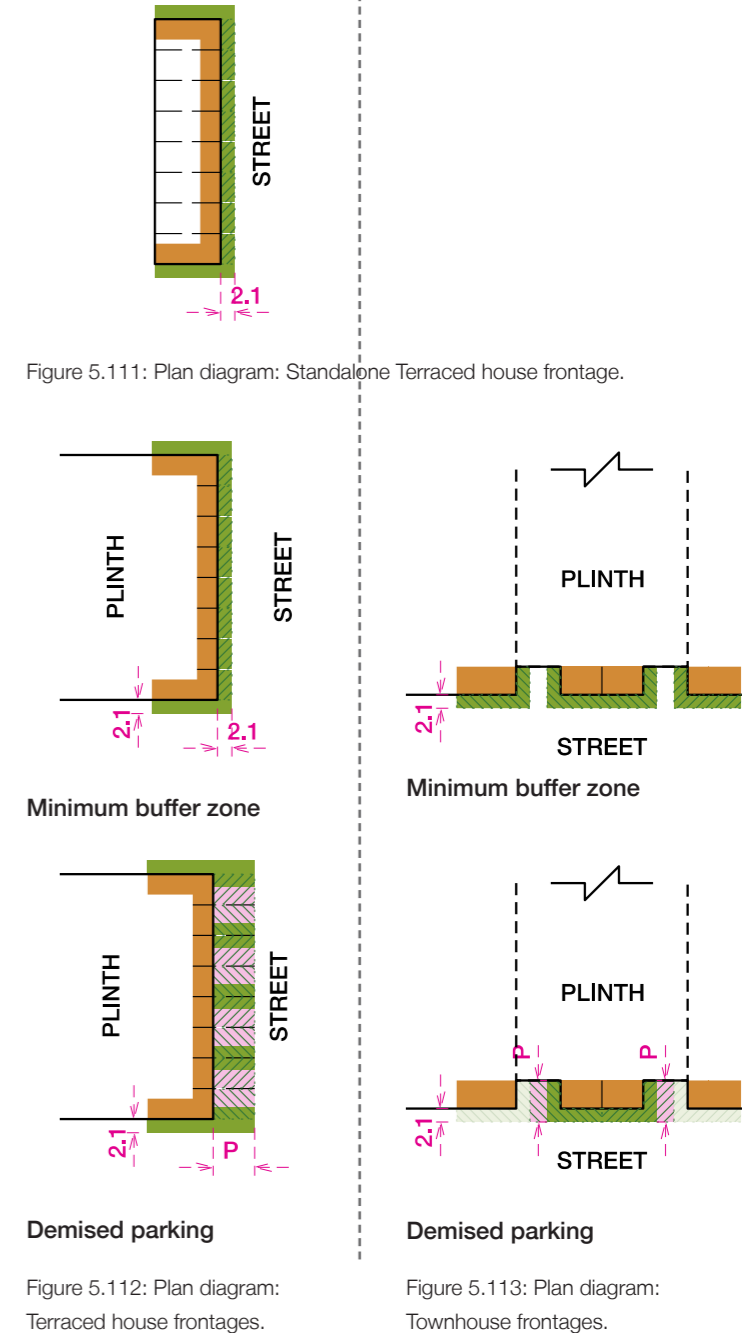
Plan diagram: Standalone Terraced house frontage.
